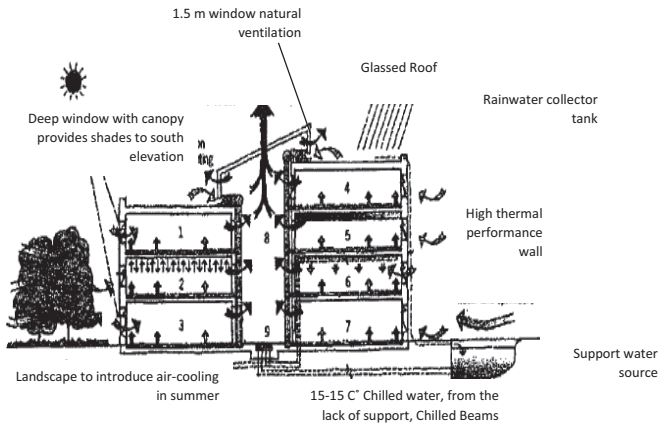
Cross ventilation through deep windows with canopy and sheds in the building. (Croome, 2003).
